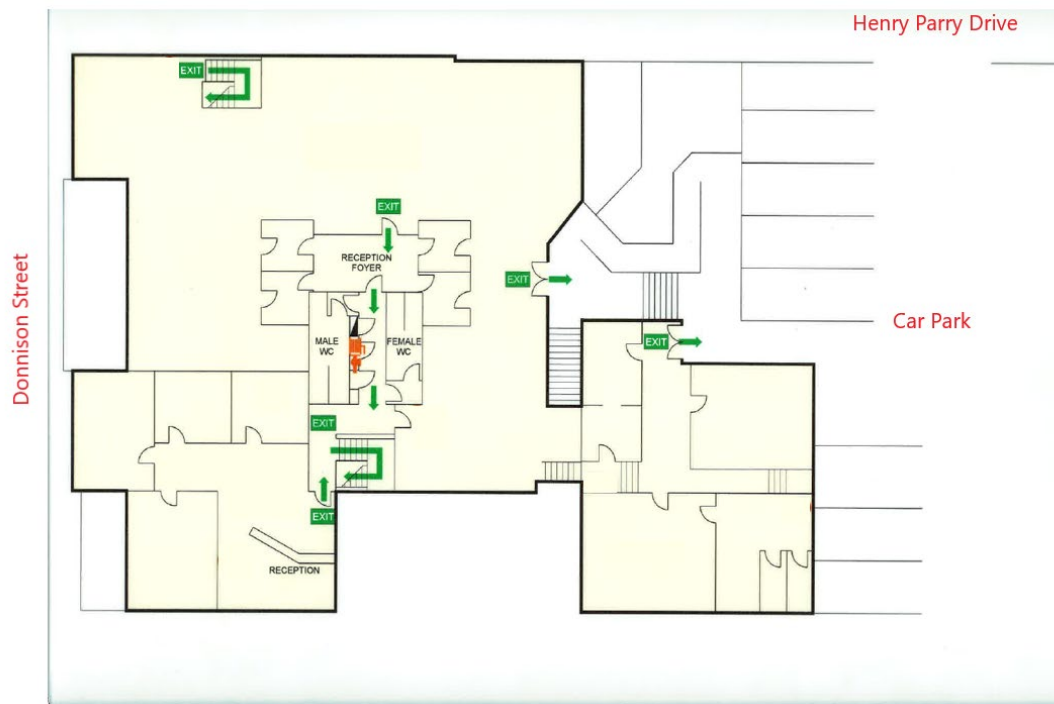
Floor plan for proposed ET Australia tenancy at 125 Donnison Street
